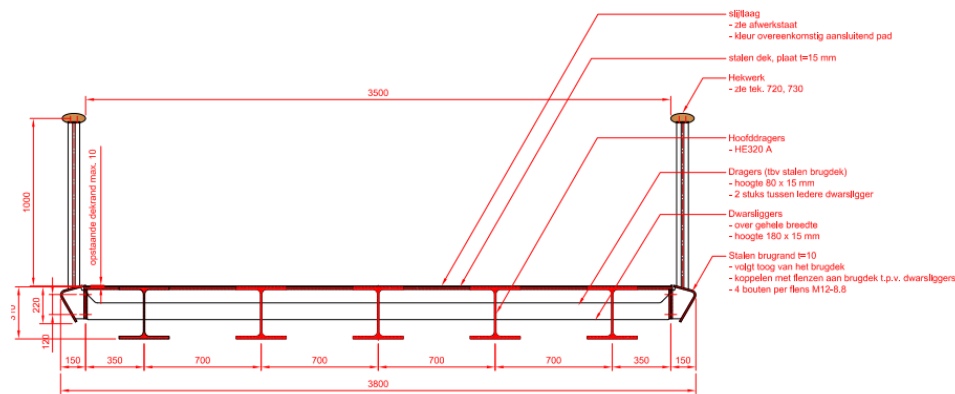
Cross section of tuinveld brug [4], example of a set of beams with a structural deck
